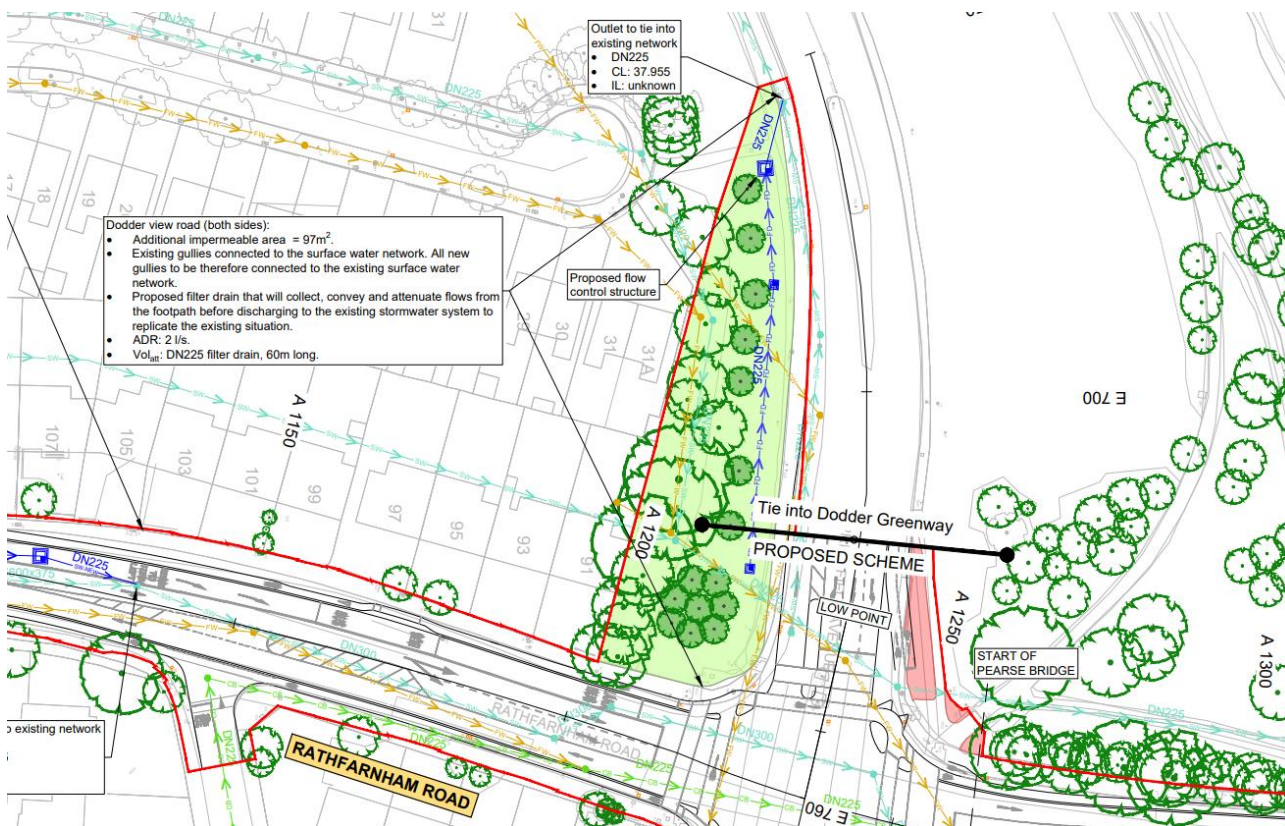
Extract from Surface Water Drainage Drawings at Dodder View Road / Rathfarnham Road junction
